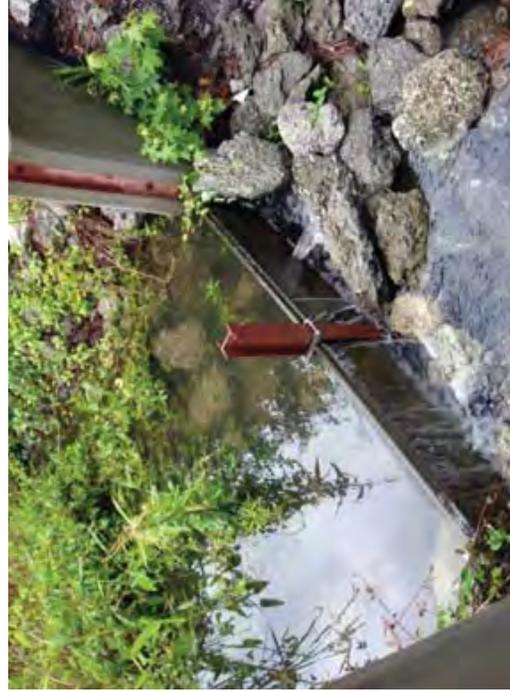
Armoring downstream of the outlet structure will reduce the potential for erosion that could threaten stability.
